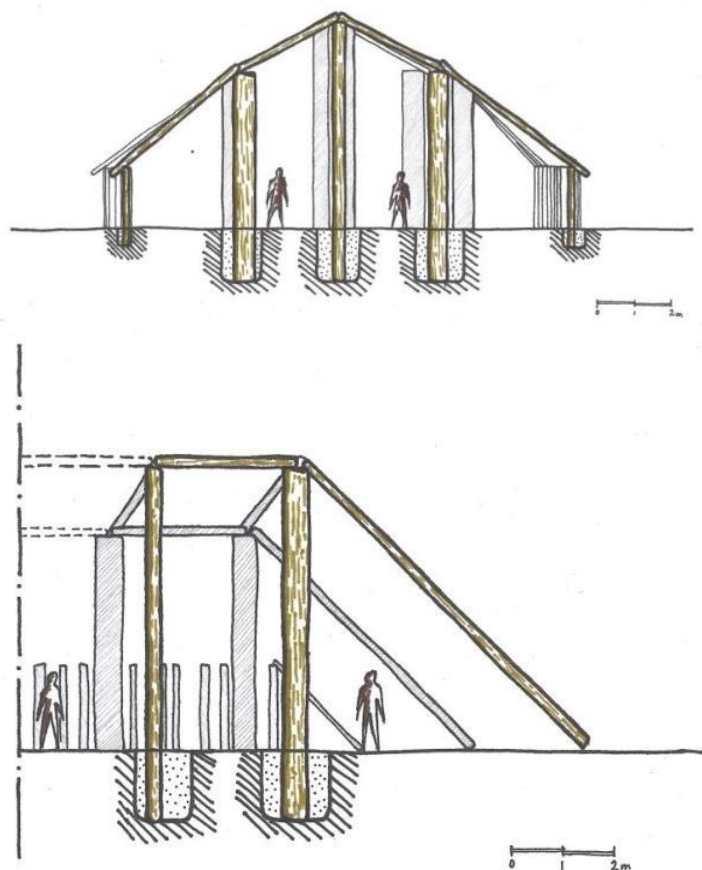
Architectural survey of the rectangular construction excavated in cuts 25, 33 and 34. Front and lateral cuts (Calderón, 2016a: 254).
